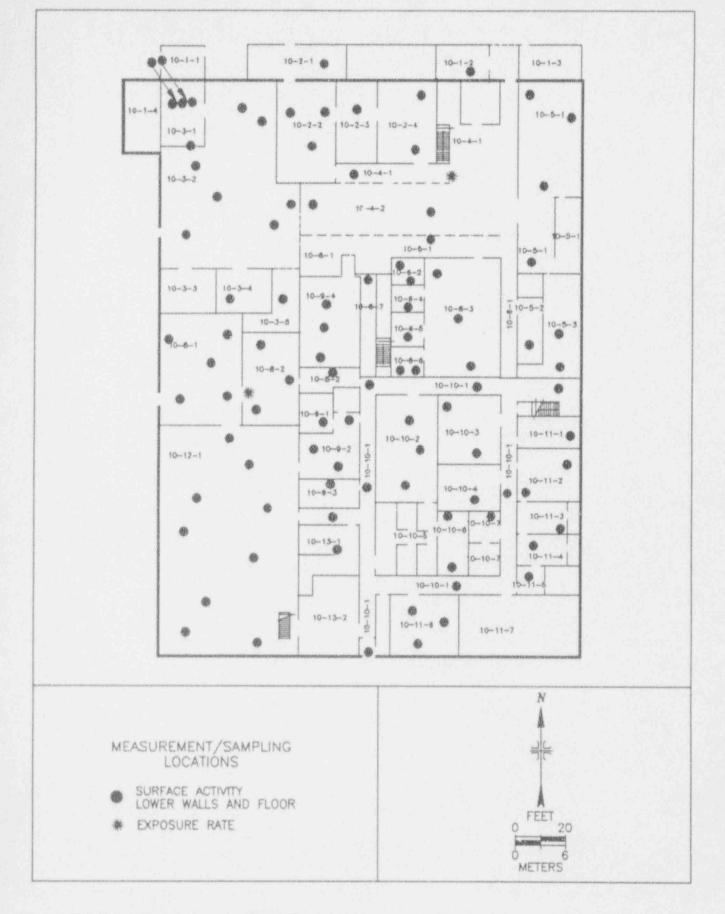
Building 9, First Floor - Measurement and Sampling Locations
